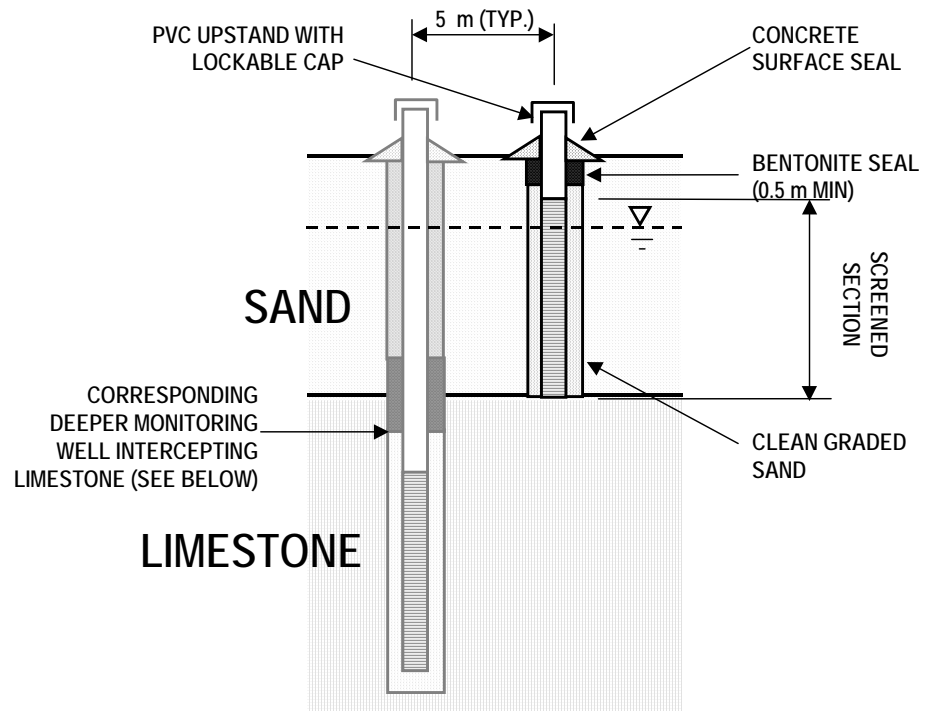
Typical construction details of wells intersecting the St Kilda Formation.
